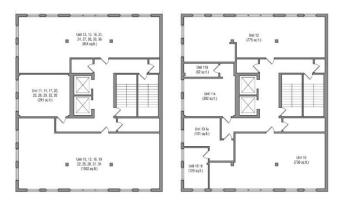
, 235 (left to right, top down): Building 8, fourth floor (1926); same floor (1981). I'' = 32'. North is to the left.
